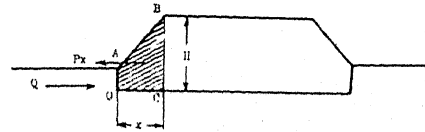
VERTICAL FISSURES ON A LOW EMBANKMENT
